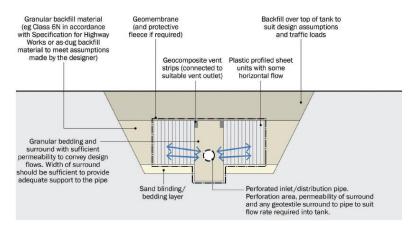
Typical Section of Geocellular System (CIRIA C753)
